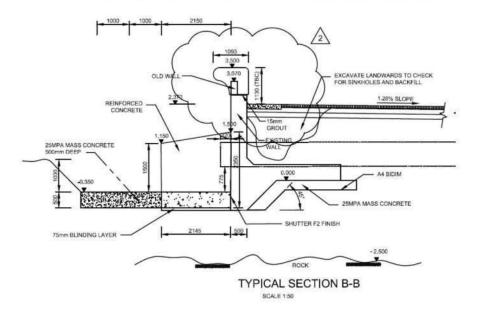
Typical Section B-B at Bart's Corner, refer to Figure 10 for section location (MMD, 2013).
